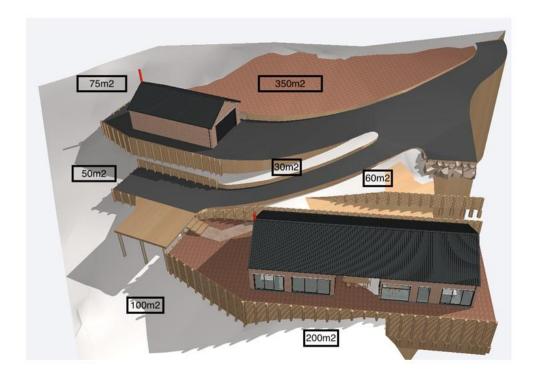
Area to be replanted following construction at proposed Lot 10, 319 Aucks Road, Okiato.
